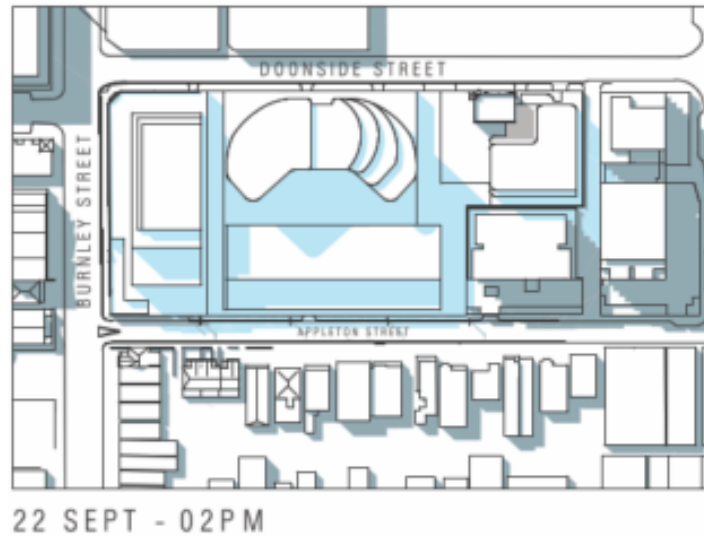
Proposed shadows between 10am-2pm. Source: Development Plan (Gurner 2023)
